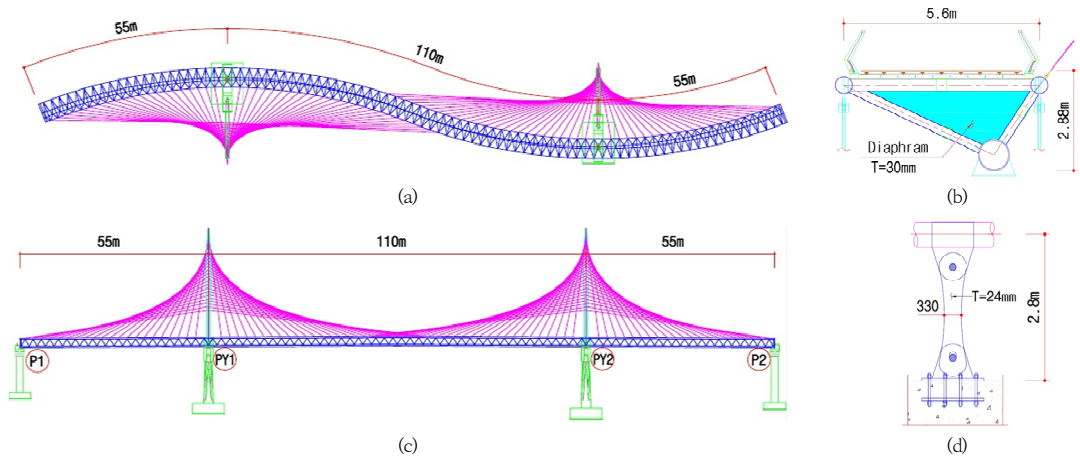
Outline Of Bridge Plans for S-Shaped Pedestrian CBS
